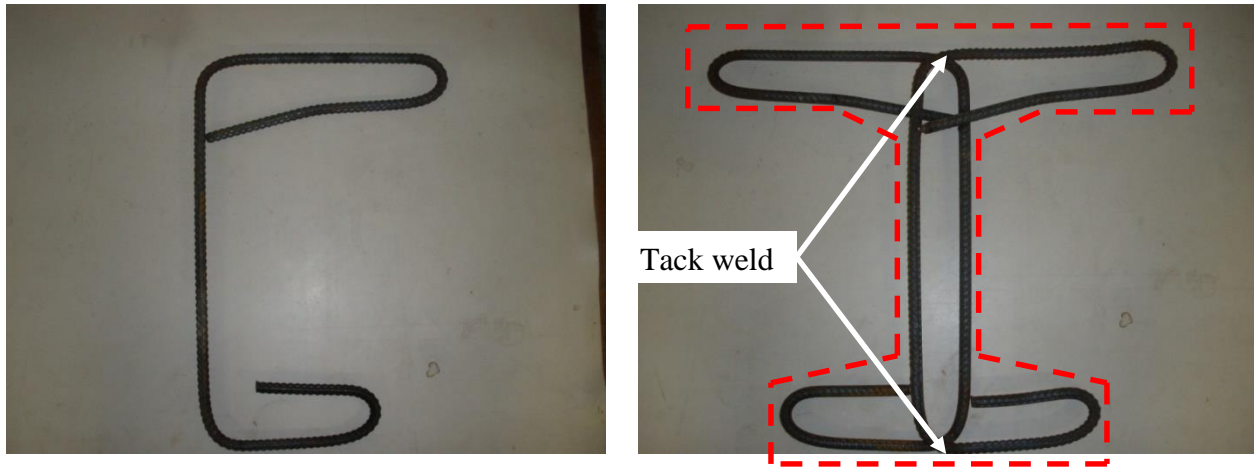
Steel stirrups of control beams other than Beam C-C-S-B
